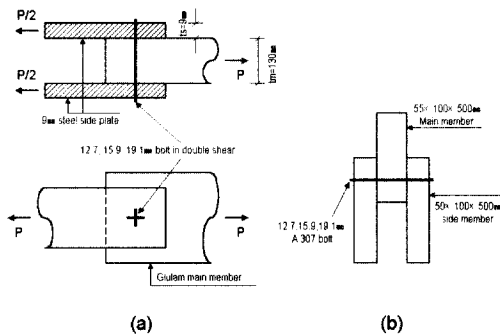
Configuration of bolted connections for wood-to-steel connections (a) and wood-to-wood connections (b).
